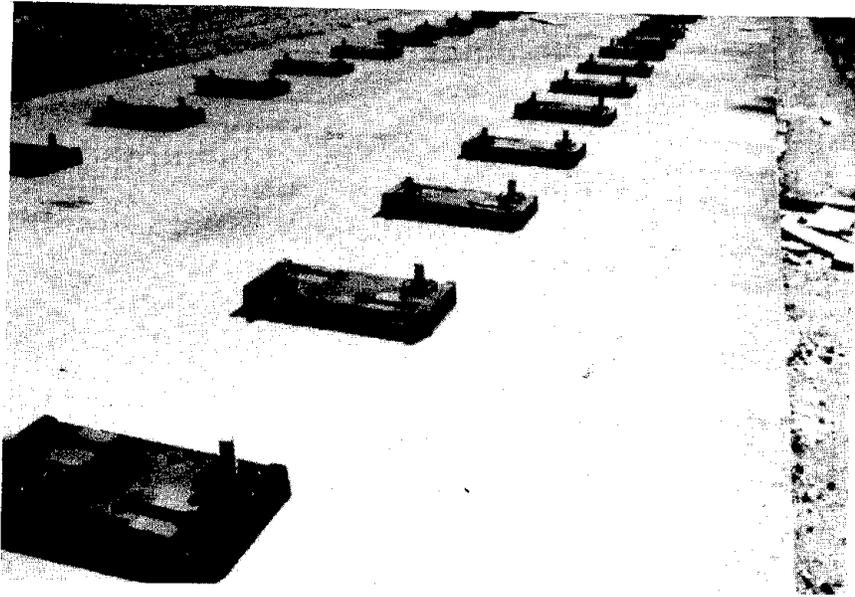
FASTENER BASE PLATES IN PLACE
